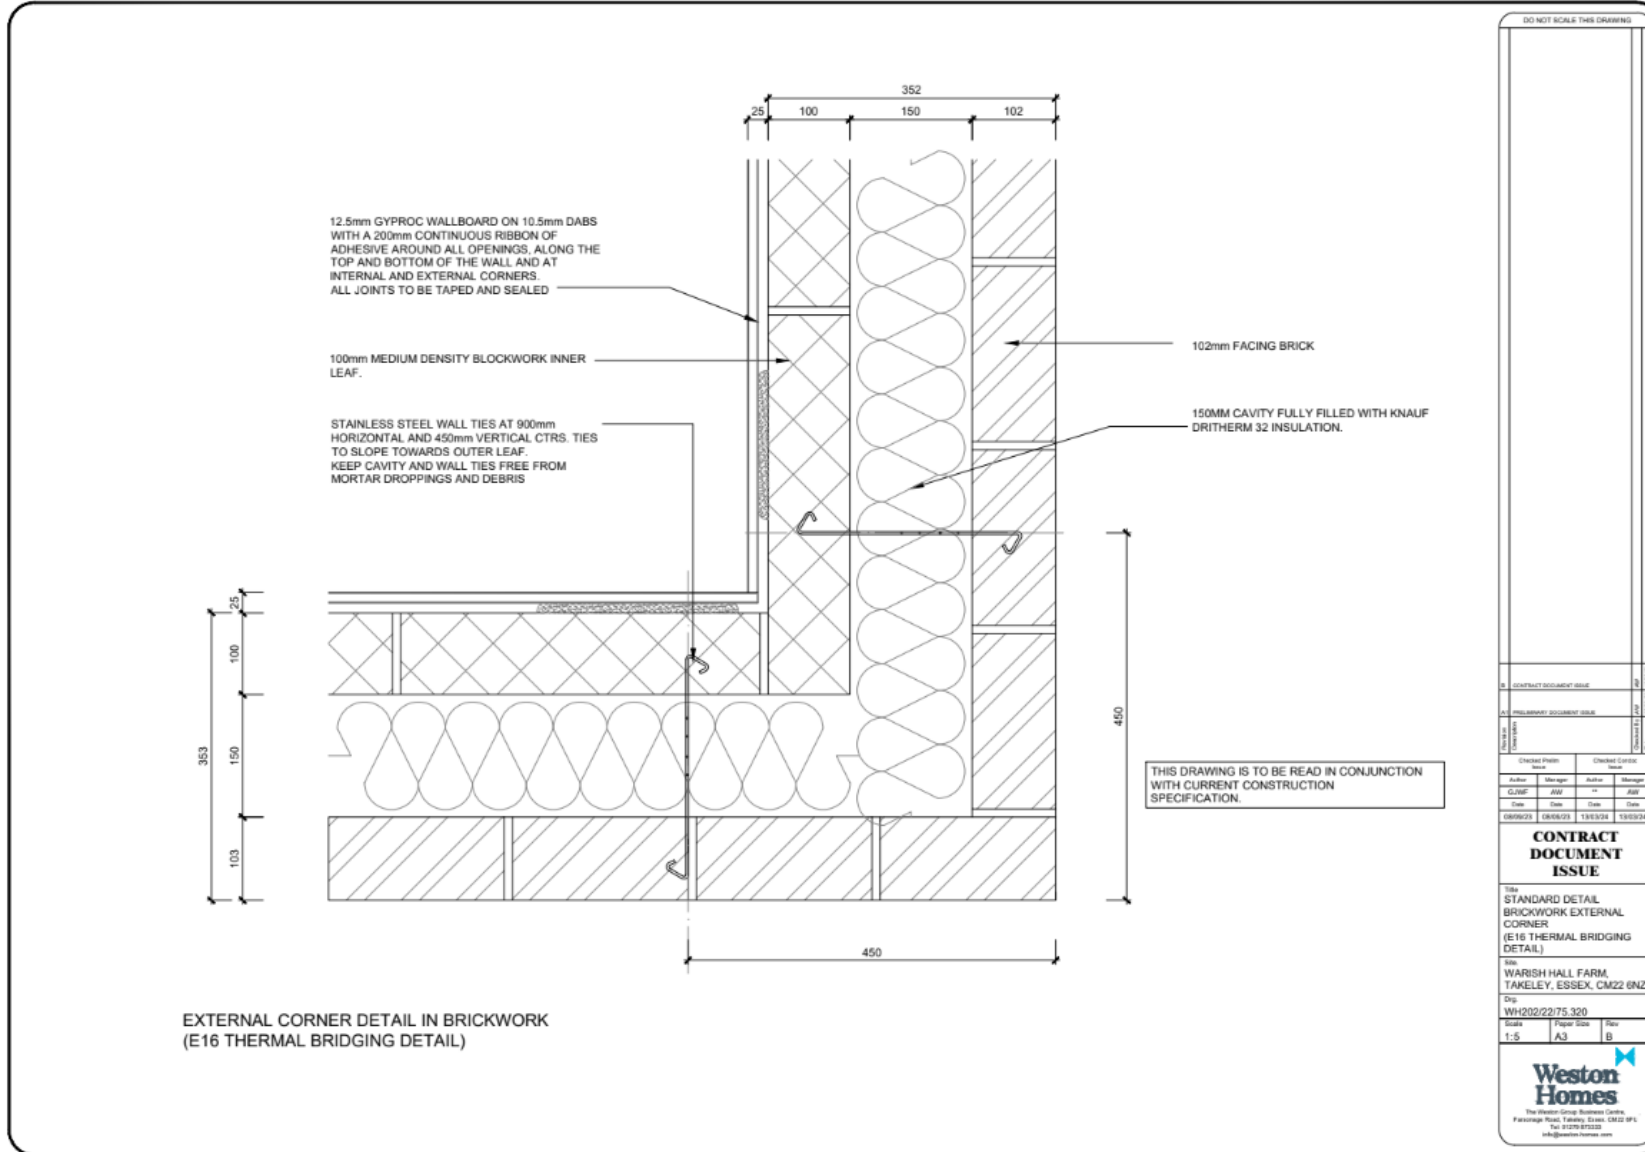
External Wall Construction Drawing WH202/22/75.320 – Jacks Lane
